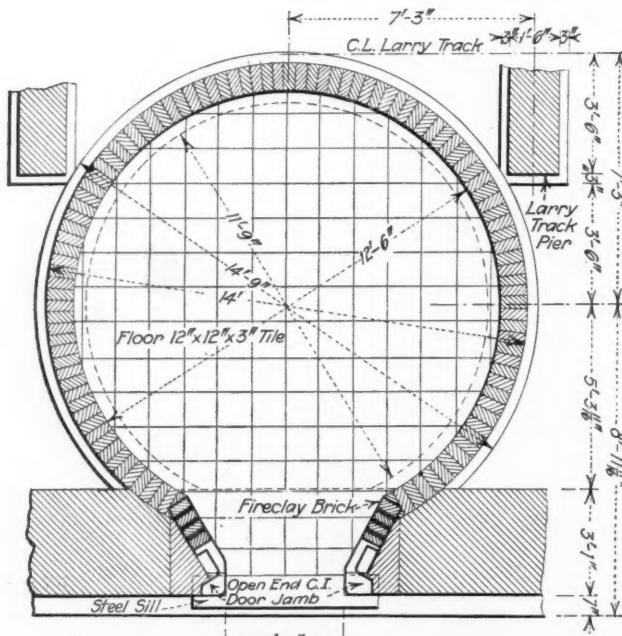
PLAN OF COKE OVEN SHOWING FRICK JAMB DETAILS
